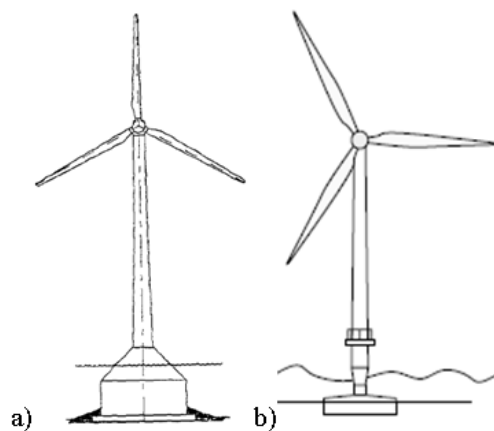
Gravity based foundation: a) concrete foundation; b) steel foundation
